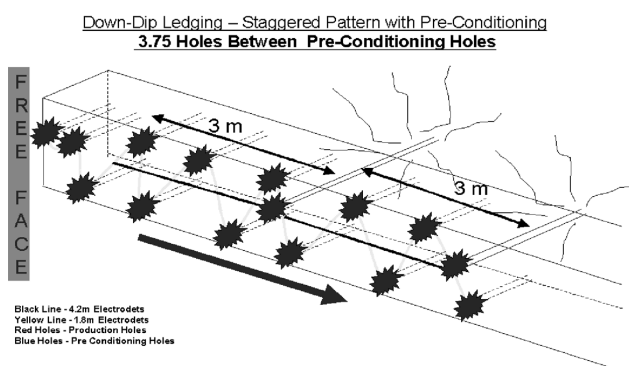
Three-dimensional face for 1.5 m drilled holes and 3.0 m pre-conditioning holes
